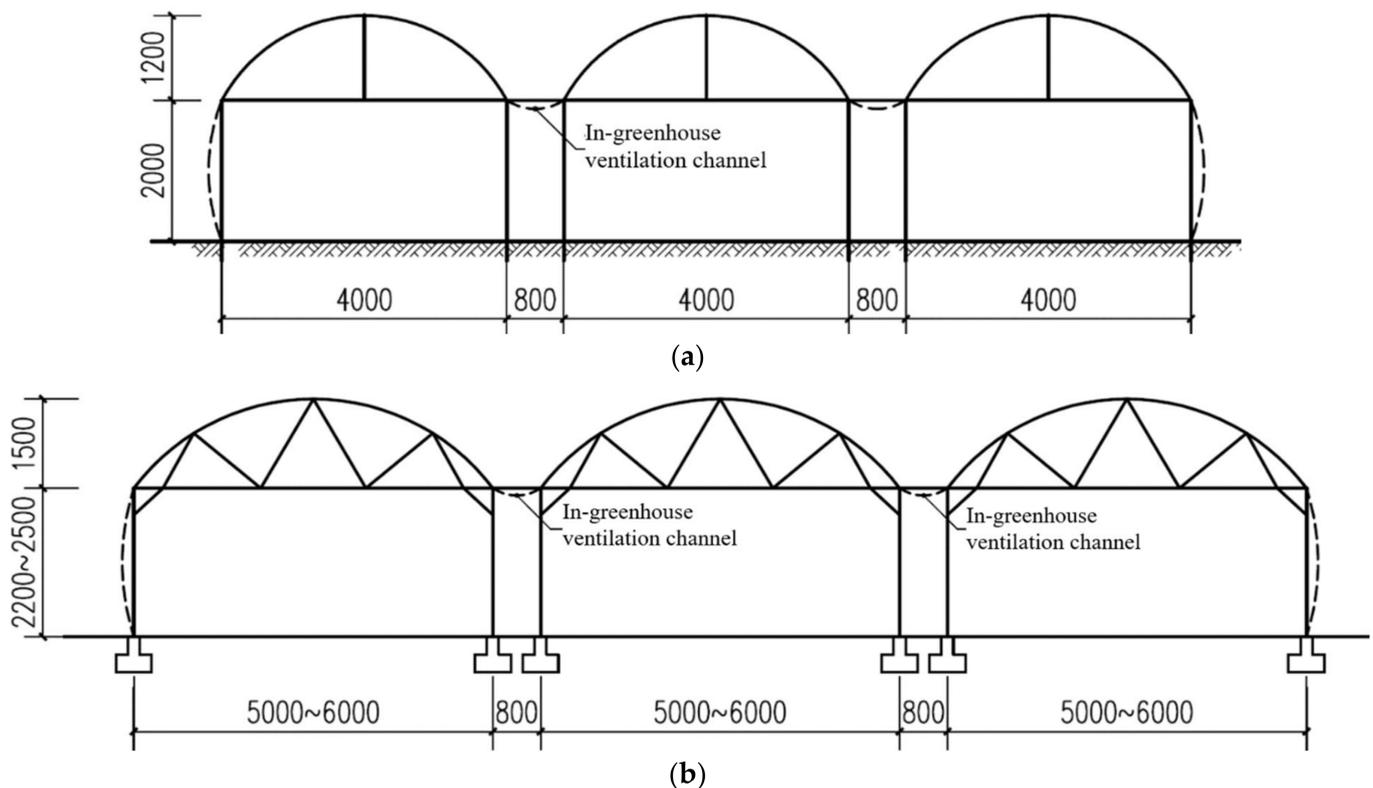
Multi-span round arch plastic greenhouse with an in-greenhouse ventilation channel (unit: mm). (a) Structure of the cantaloupe greenhouse; (b) Structure of the Hainan year-round vegetable production greenhouse.
